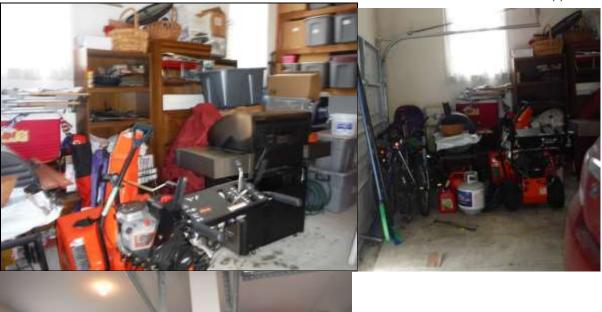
Garage had wall to wall & perimeter storage everywhere; inaccessible. Have removed and inspected for termite & structure before closing. See NPMA-33 Termite report.
